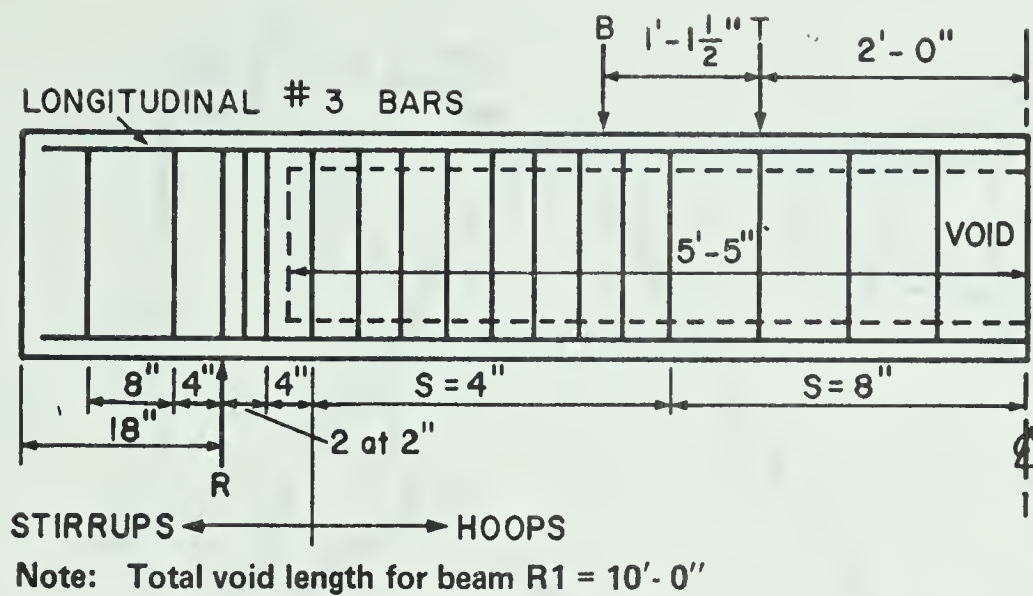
(A) REINFORCEMENT FOR BEAMS R1 AND R2
